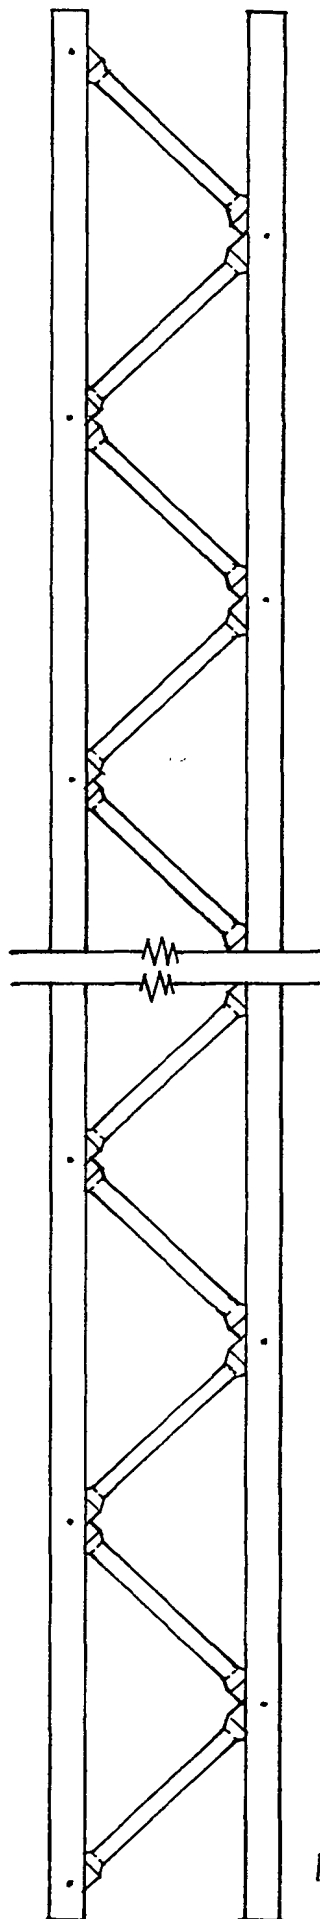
ELEVATION SECTION. Mr. D.H. COND. P. K. Bodd
